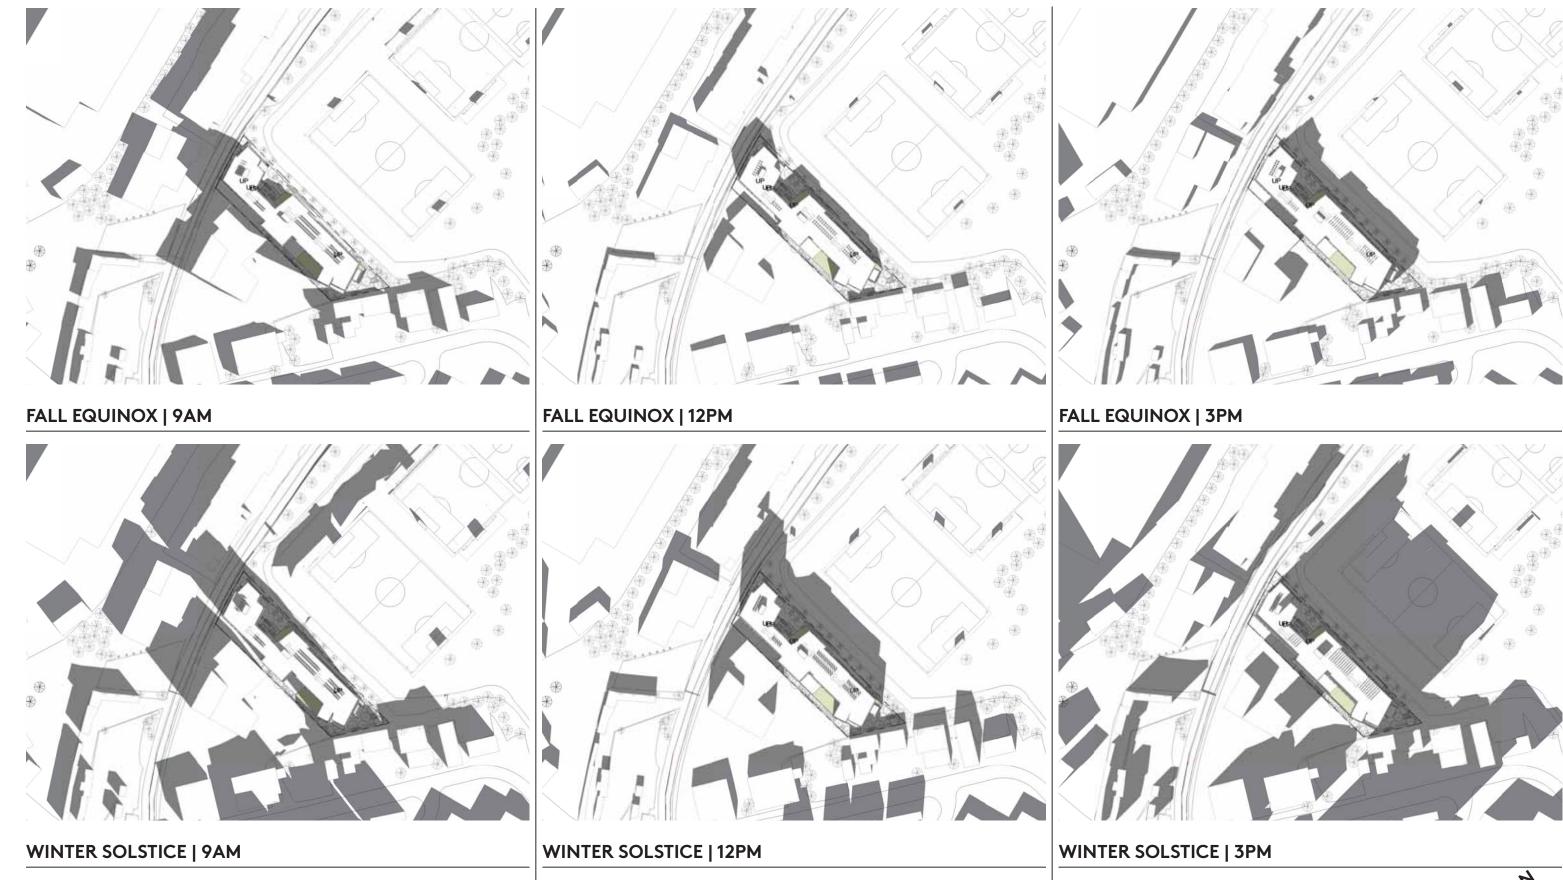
EXHIBIT B - PROPOSED PLAN 52 NEW STREET / 12/14/2021 / FIG 65
